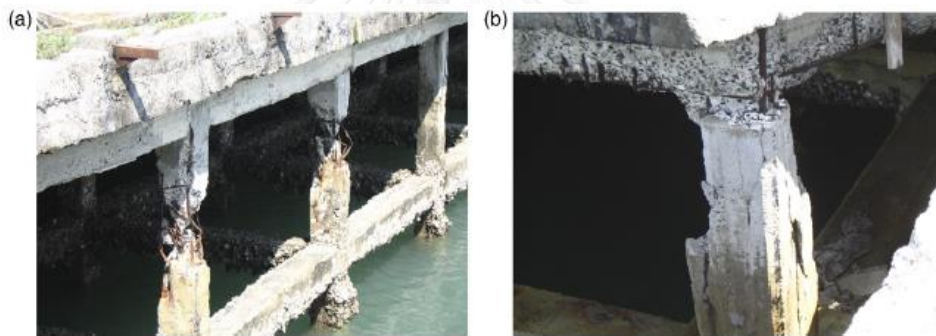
Rangat Bay Harbour at Middle Andaman: (a) Damaged columns of approach jetty (b) Damaged beams and piles. (Goutam Mondal, Durgesh C. Rai, 2006)
